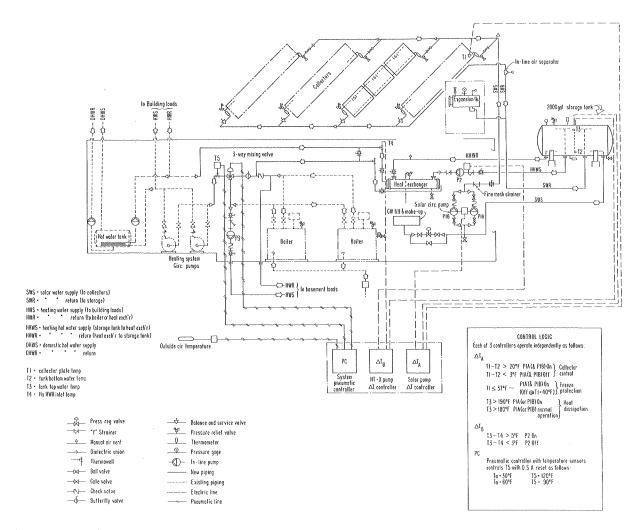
Building 90 solar retrofit piping and control schematic. Engineering Drawing 4B90-P043-B. (XBL 791-102)
